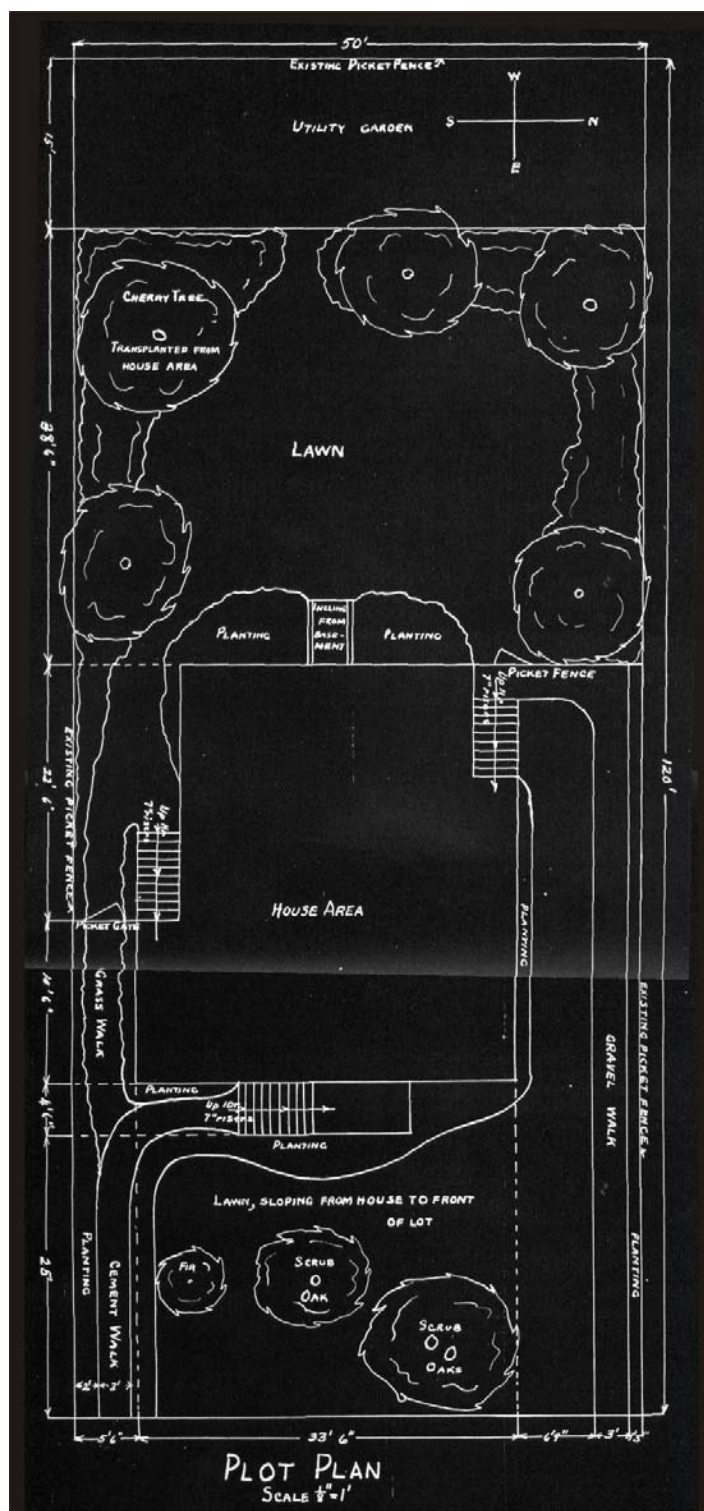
Landscape and garden plan of Mildred Barker's 1058 Oliver Street property; a special effort was made to transplant a cherry tree from the area where the house was to be built to the south-west corner of the garden.
